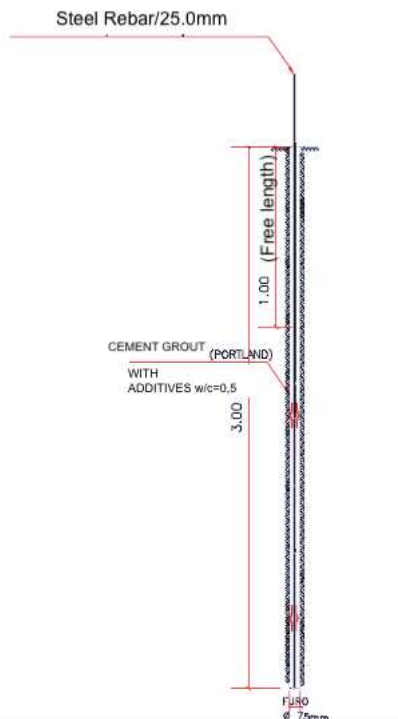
Detail of gravity grouted nails with additive (GA) (in red in Figures 1 and 2)
